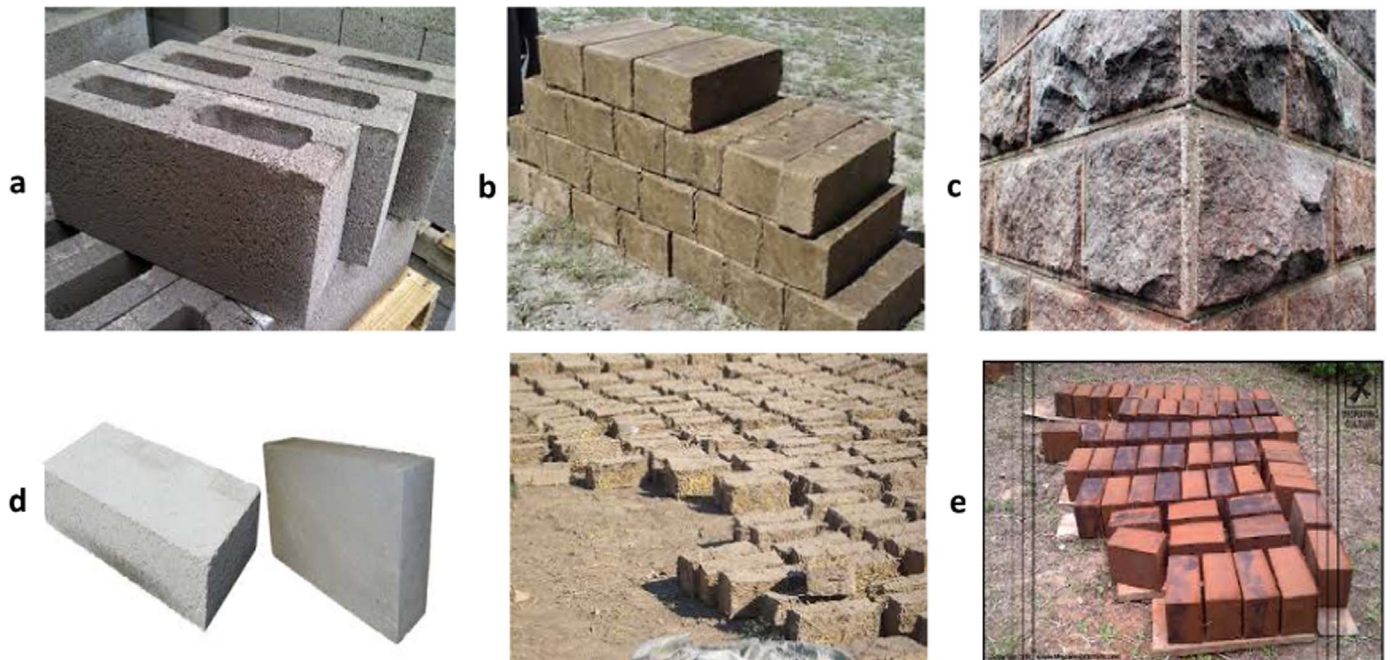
Building materials found in the tropical region of Cameroon. (a) Hollow concrete block, (b) Sundry block, (c) Stone, (d) Heavyweight concrete block, and (e) compressed earth block.
